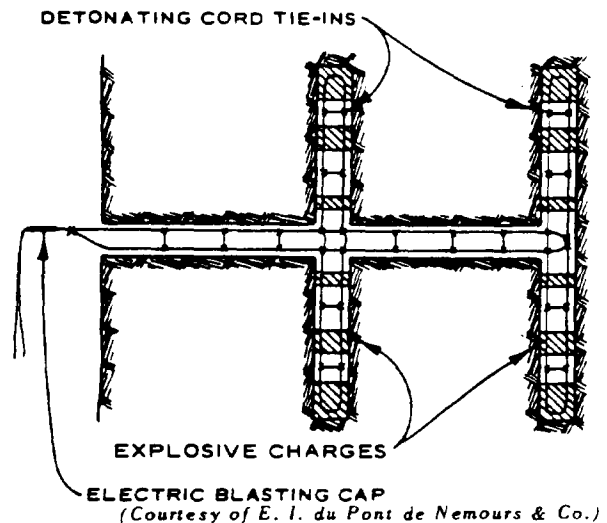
Plan of coyote layout with detonating cord (after Du Pont<sup>8</sup>)
